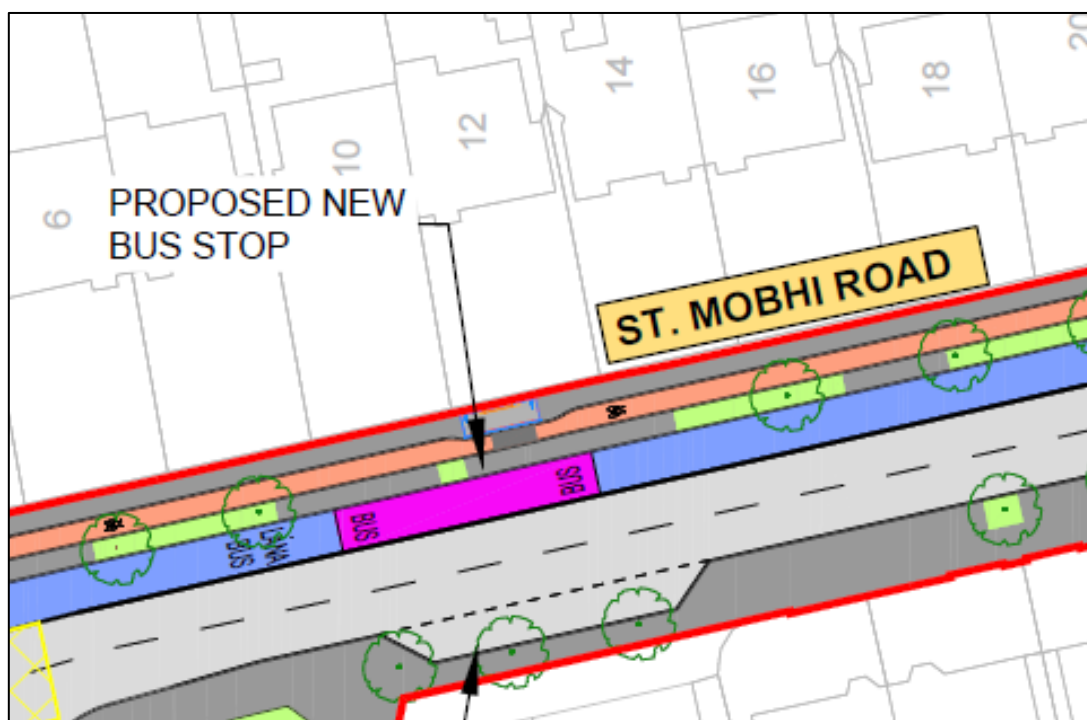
Proposed Location of Bus Stop No.39 (extract from General Arrangement Drawing Sheet No.8)
